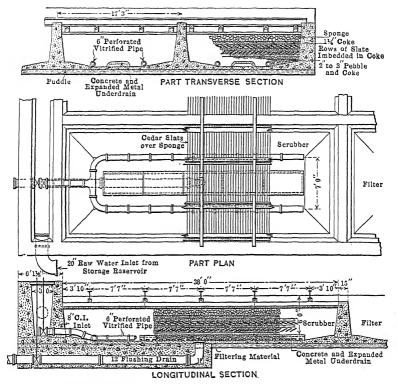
Details of filtering materials and piping connections of scrubbers at So. Bethlehem plant.
